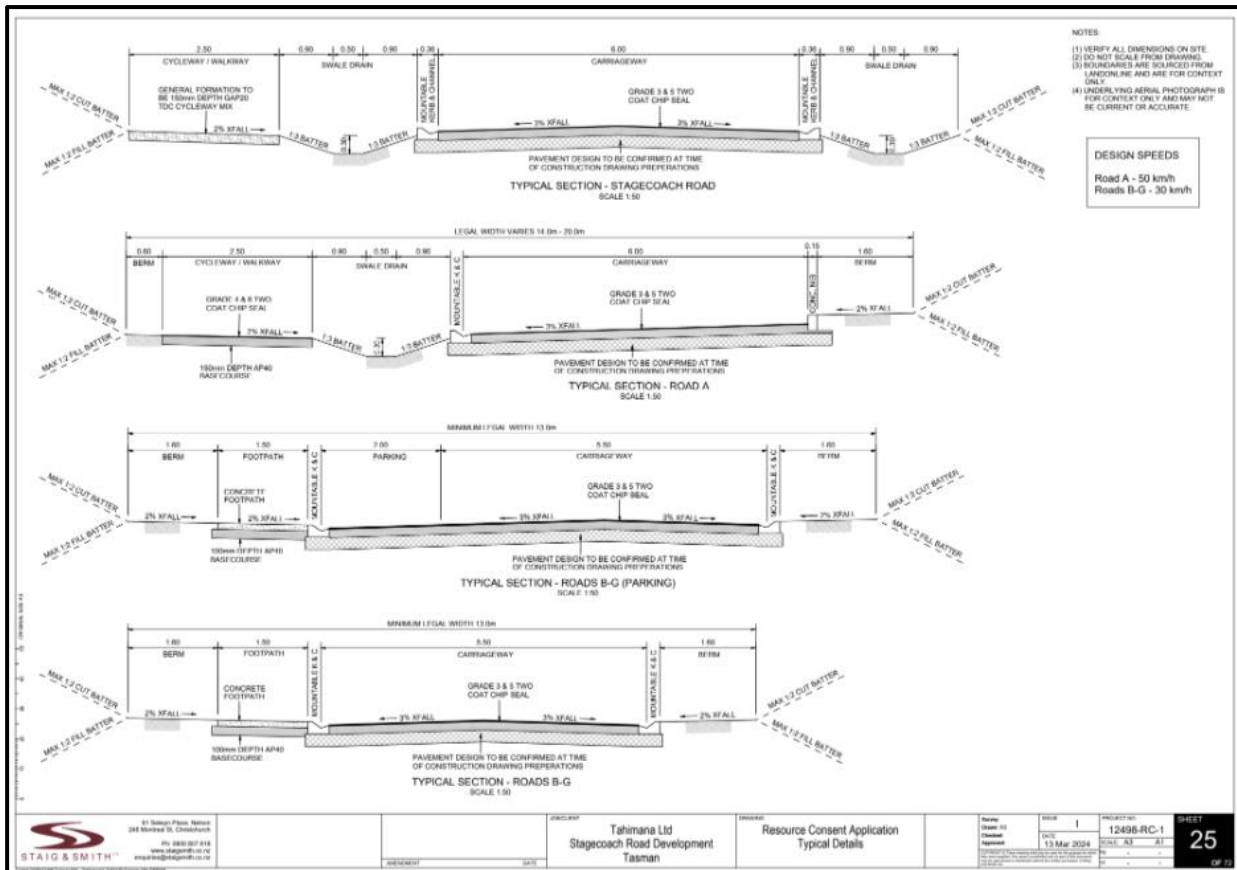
Typical Road Cross sections. (Source: Staig & Smith Plan 12498-RC1 Sheet 25)
